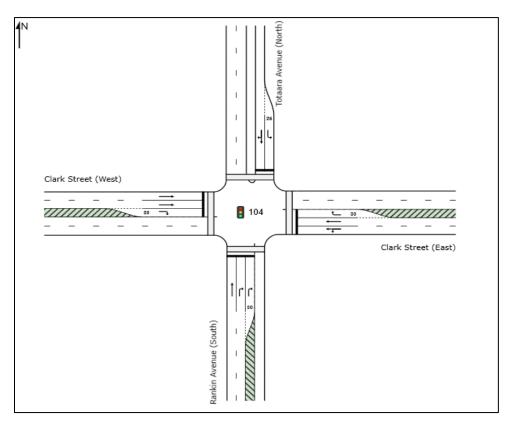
SIDRA intersection layout - Clark Street / Rankin Avenue / Totara Avenue
